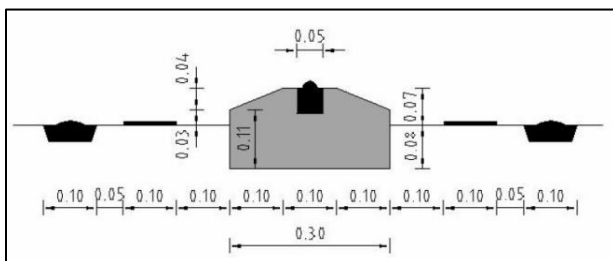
Turbo Roundabout Raised Lane Divider Detail (Fortuijn)
